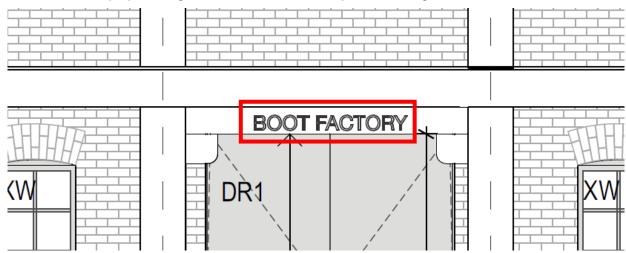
Extract of north elevation, proposed sign outlined red (Source: Archer Office)
